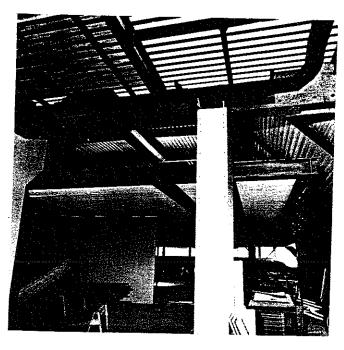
a. Steel columns with fire insulation in the form of gypsum plaster slabs. The girders are insulated with slabs of mineral wool
